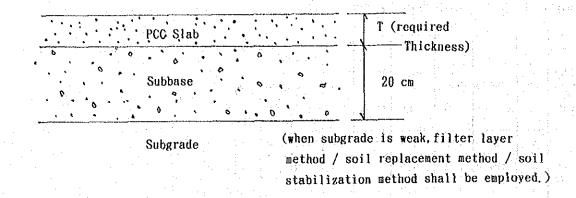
TYPICAL CROSS SECTION OF PCC PAVEMENT
